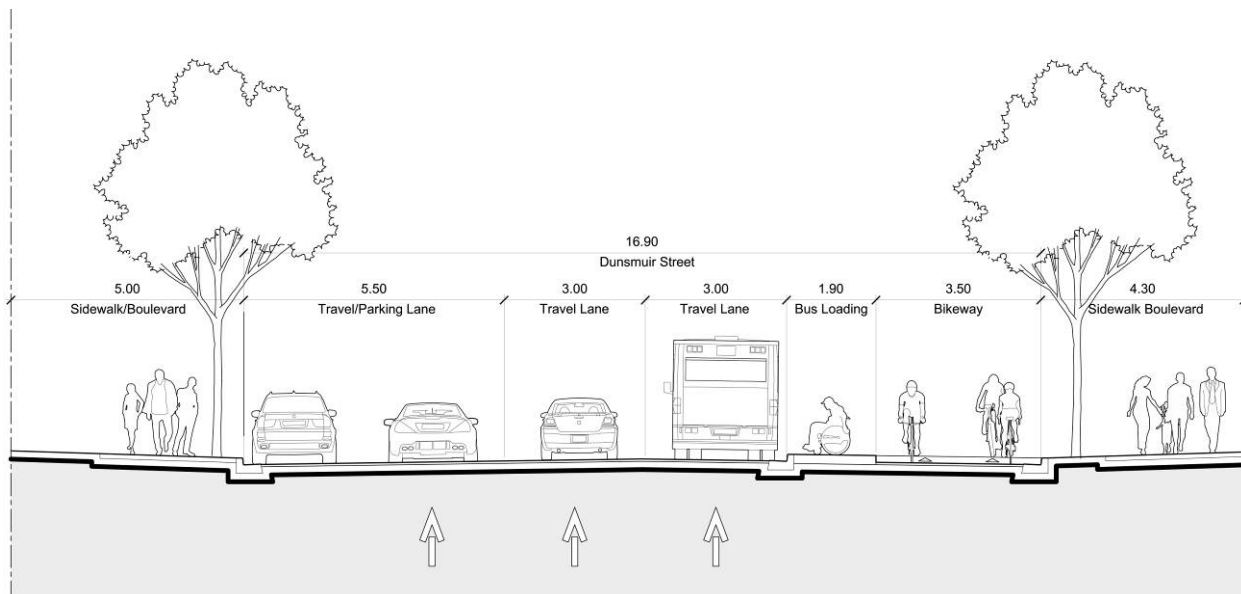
Proposed cross-section of a transit stop along Dunsmuir Street (looking west)
